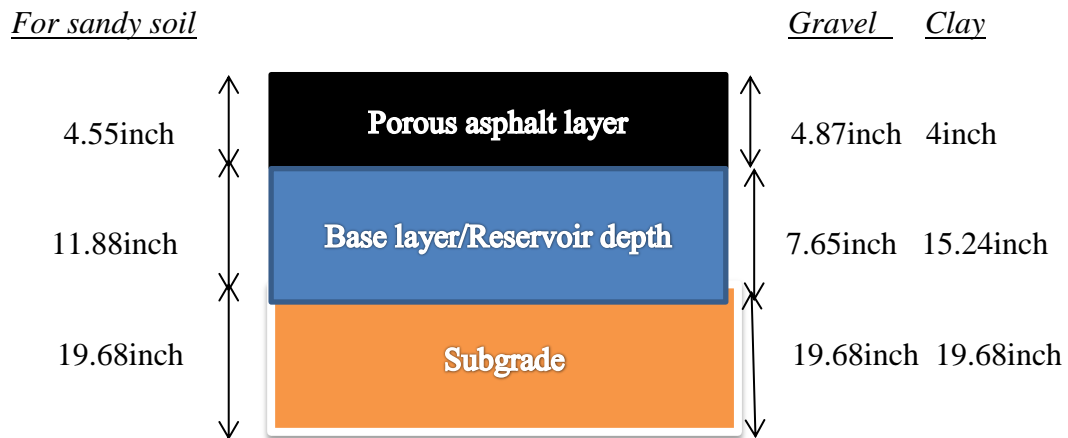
Section of Porous Asphalt Pavement as per Design of 25000 ESALs
